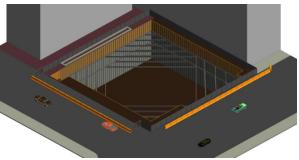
SLURRY WALL DETAIL WITH DIAGONAL BRACED
